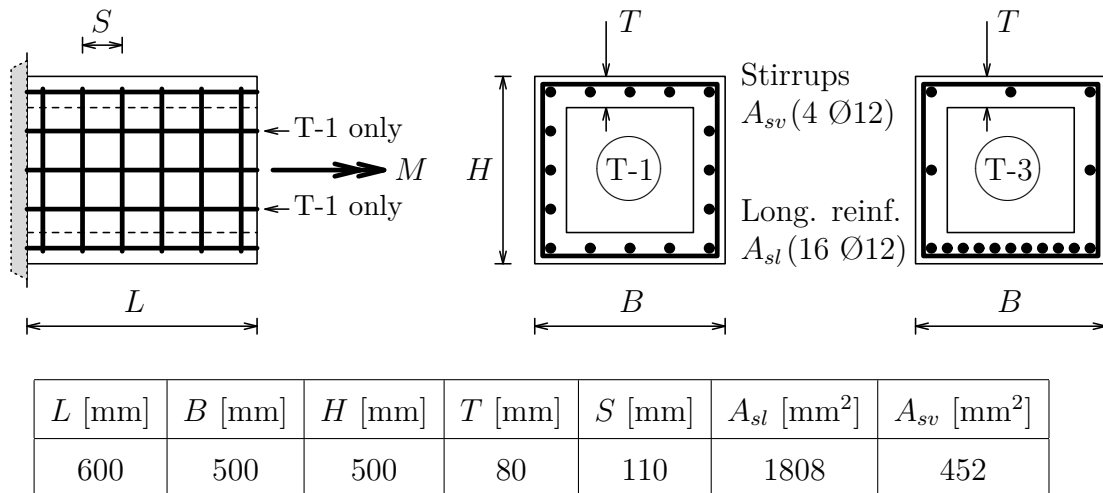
Simplified Layout of Lampert/Thürlimann Box Beams T-1 and T-3
